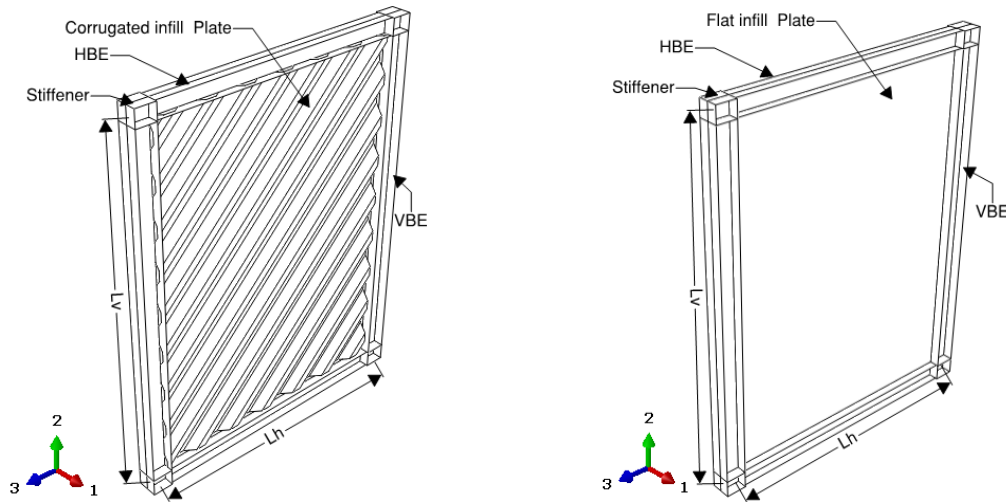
Typical shear wall layout with corrugated web and flat infill plate
